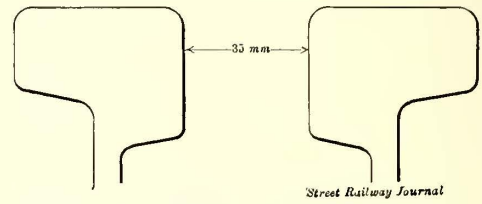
SECTION OF CONDUIT SLOT, BUDA-PEST
